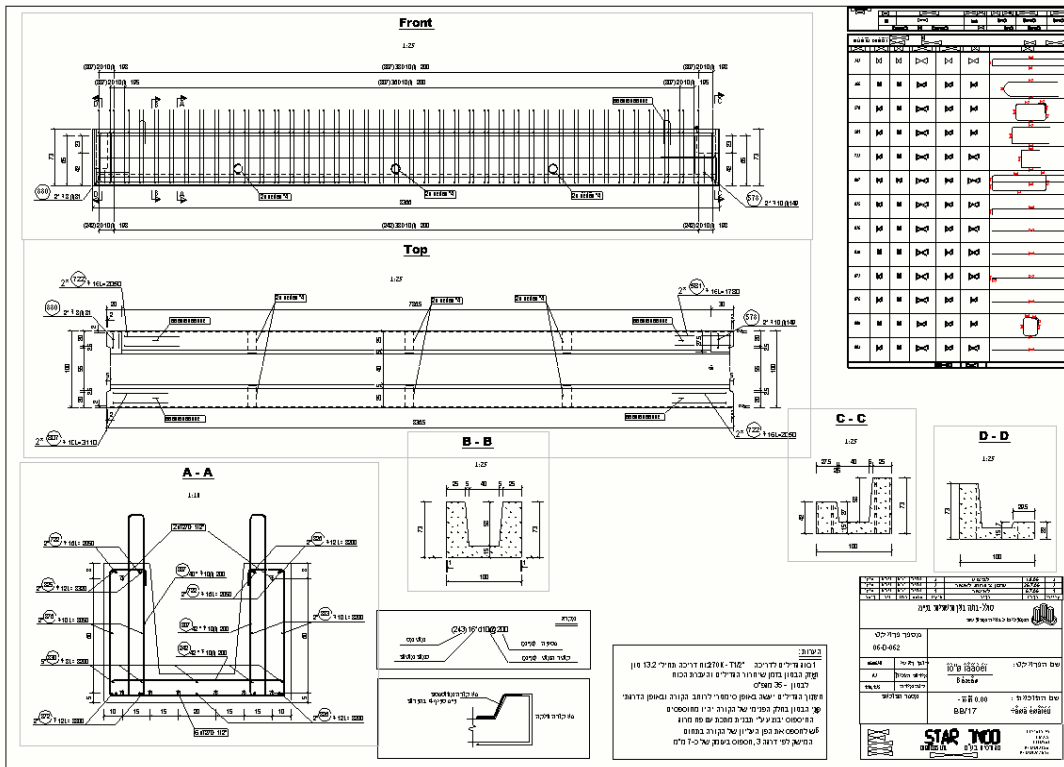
A typical precast girder shop drawing. Note the detailed rebar schedule with callout shapes at the top right.
